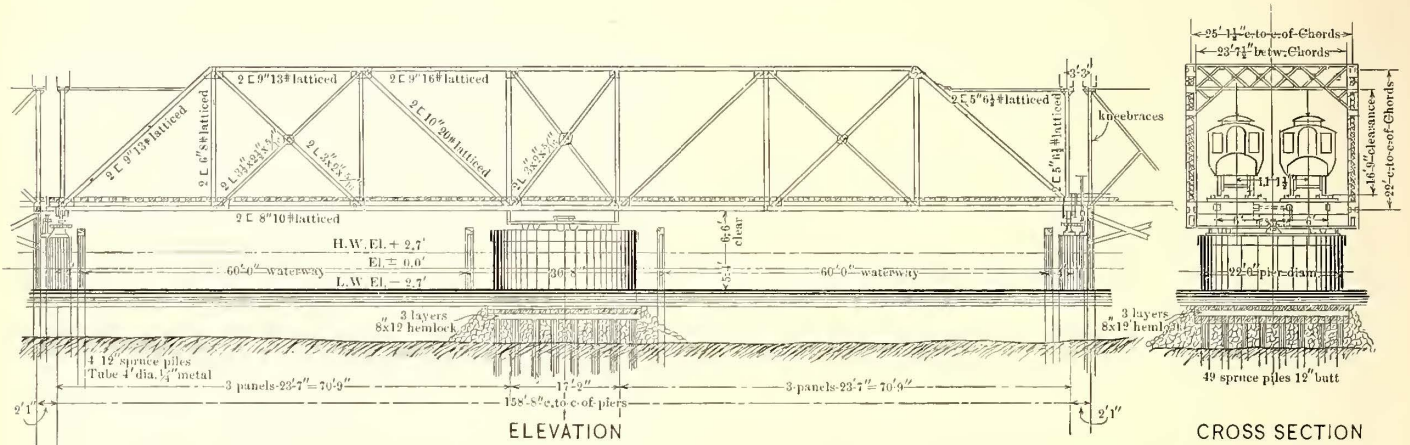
SIDE ELEVATION AND CROSS SECTION OF BRIDGE ACROSS THE HACKENSACK RIVER
